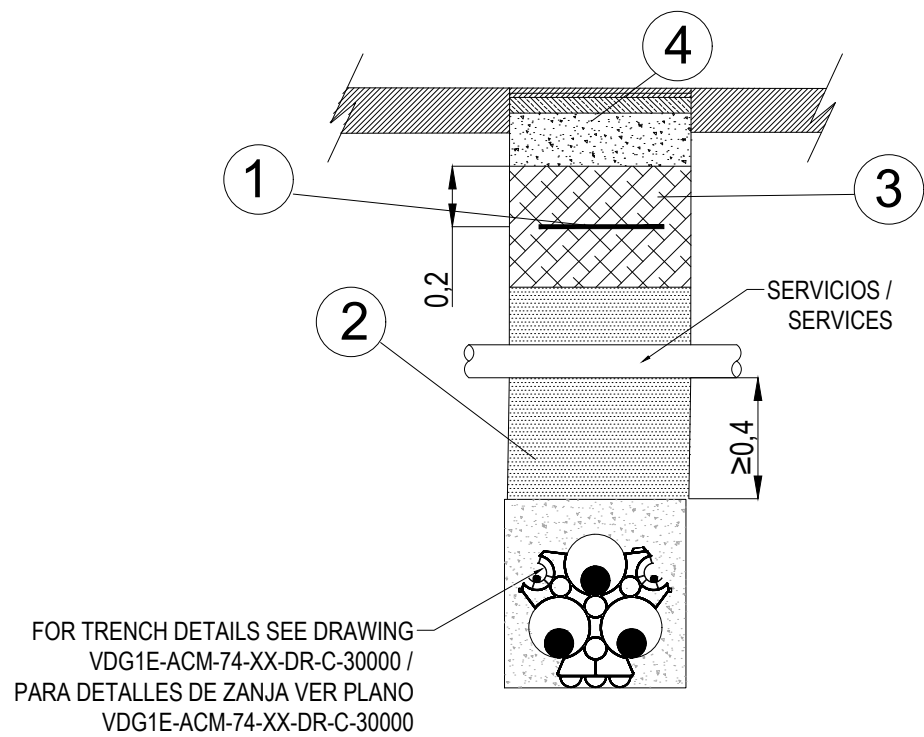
TYPICAL SECTION FOR PARALLEL SERVICES
